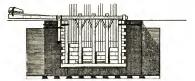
Section of a typical stanch or flash-lock, From Belidor, 1753.
